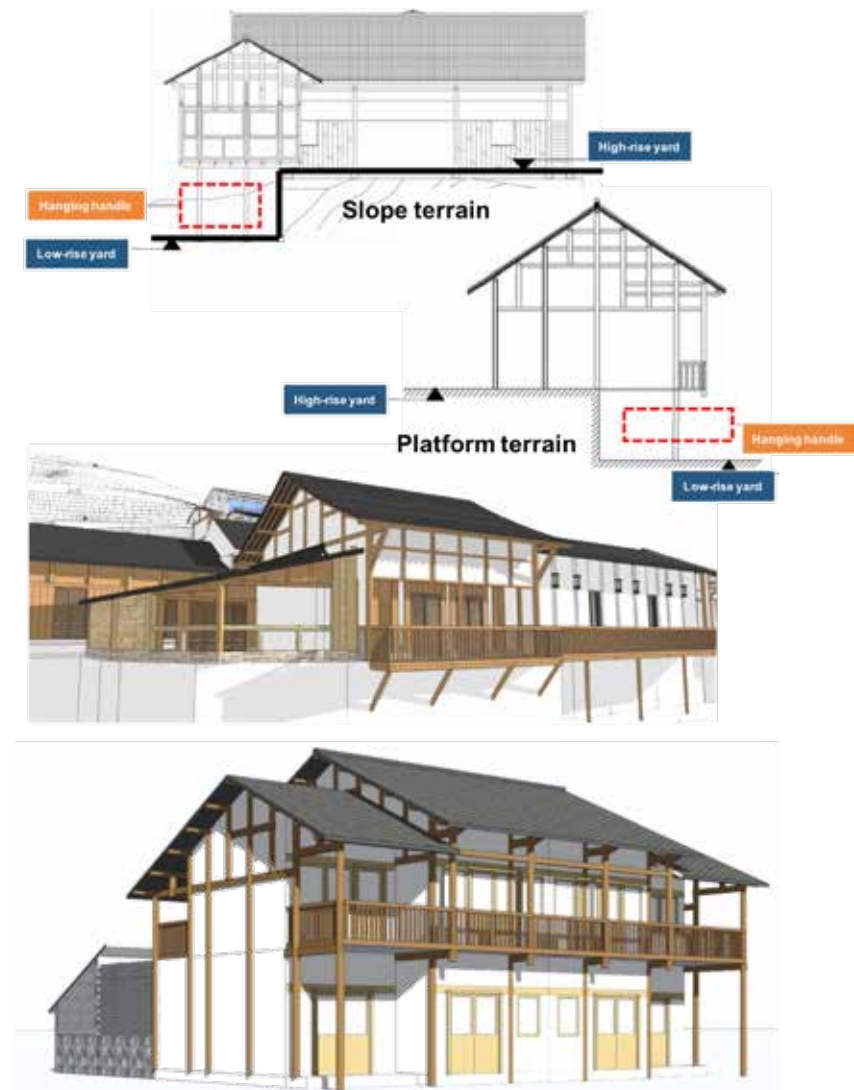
hanging building adapted to the terrain(source:drawing by author)
